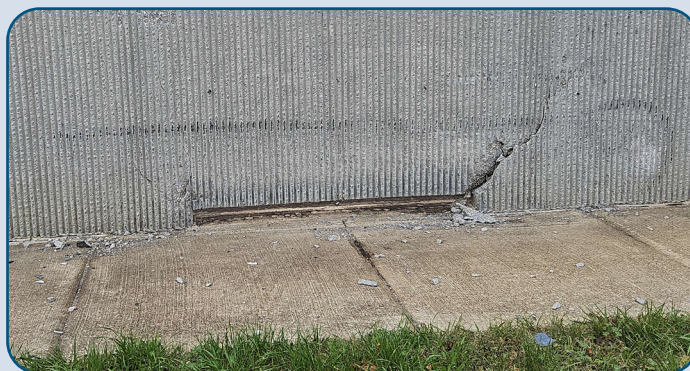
360T SB MSE Wall Panel Damage North of Debbie Ln.
